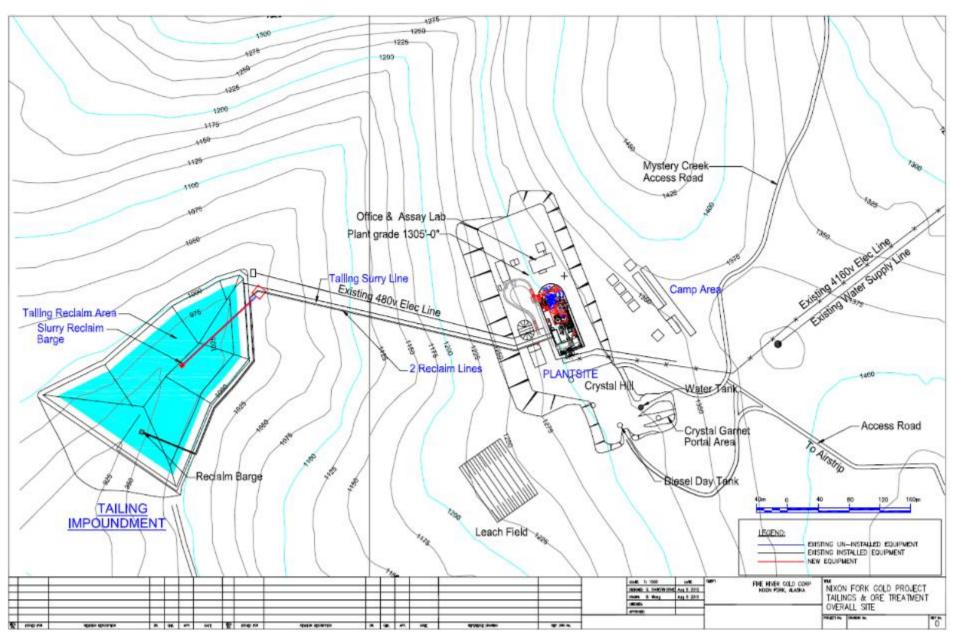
General Site Plan from Tailings Impoundment to Mill and Plantsite
